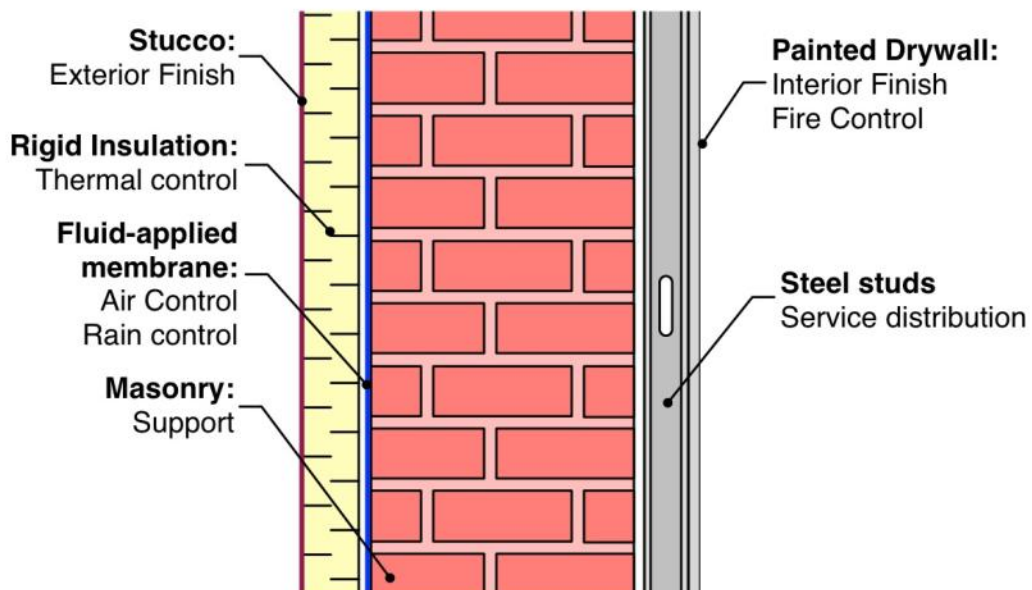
Exterior retrofit of solid masonry wall showing control layers.
